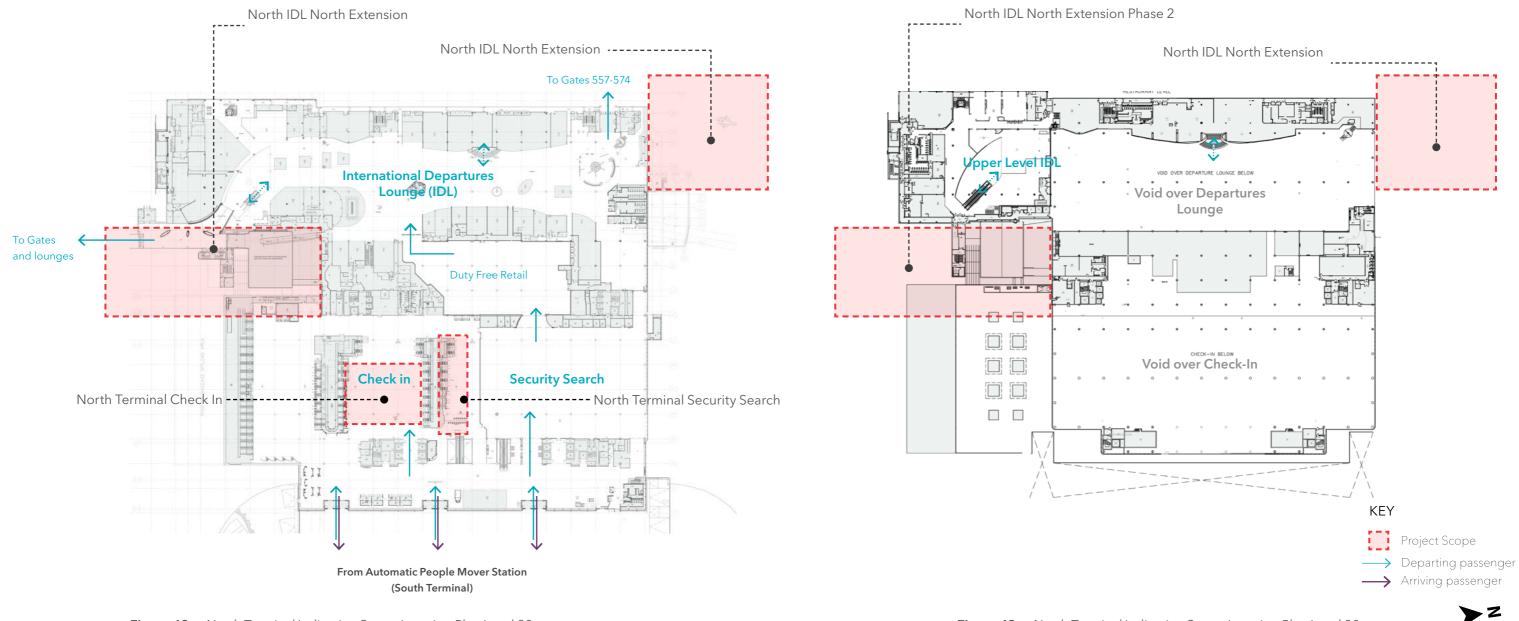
North Terminal Indicative Scope Location Plan Level 30
